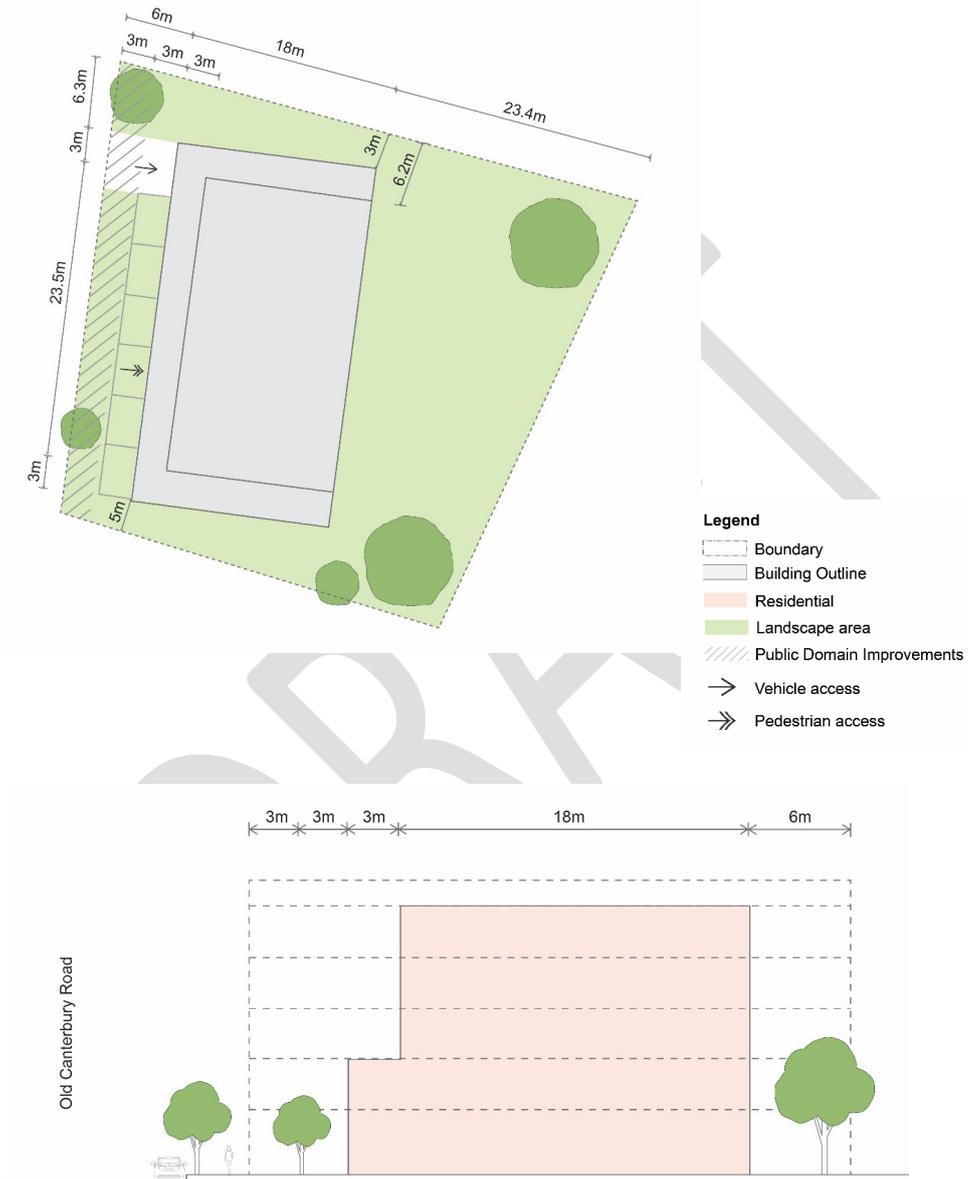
Old Canterbury Road East, northern site – indicative solution that achieves storeys, building envelope, scale and site layout – plan and section
